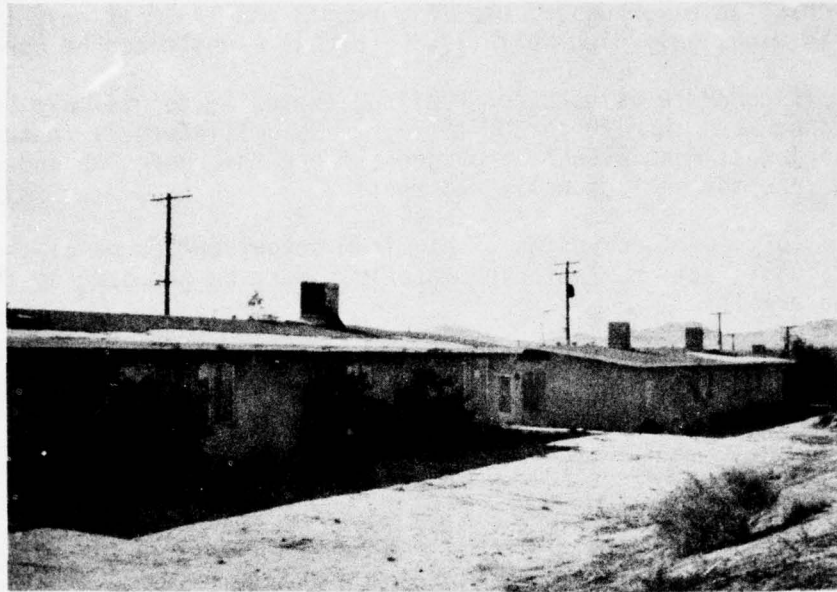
Typical built-up roofing torn apart by wind (Fort Irwin, CA).
